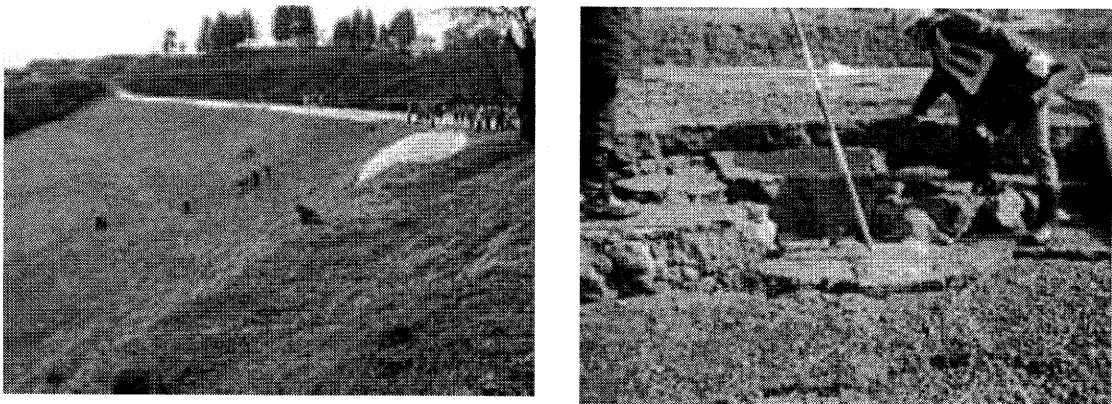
Downstream View (left) and Cracks on the Crest (right) of Asagawara Dam. Trenches excavated at 3 cross sections and 8 borings on the dam body revealed that
